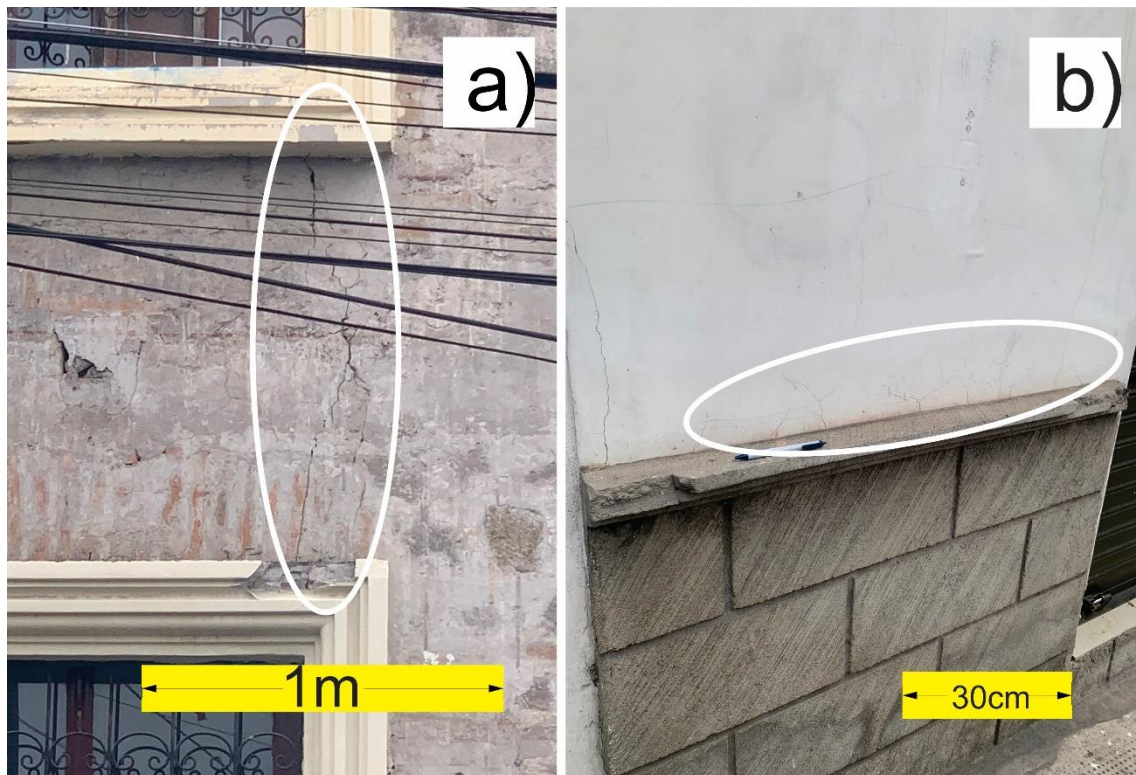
Deterioration by cracks, a) Upper part of a three-floor construction with >1m cracks. Juan Jose Flores street & Vicente Rocafuerte b) Middle part of a concrete wall with microcracks of <1mm. Rafael Troya street & Antonio José de Sucre.
